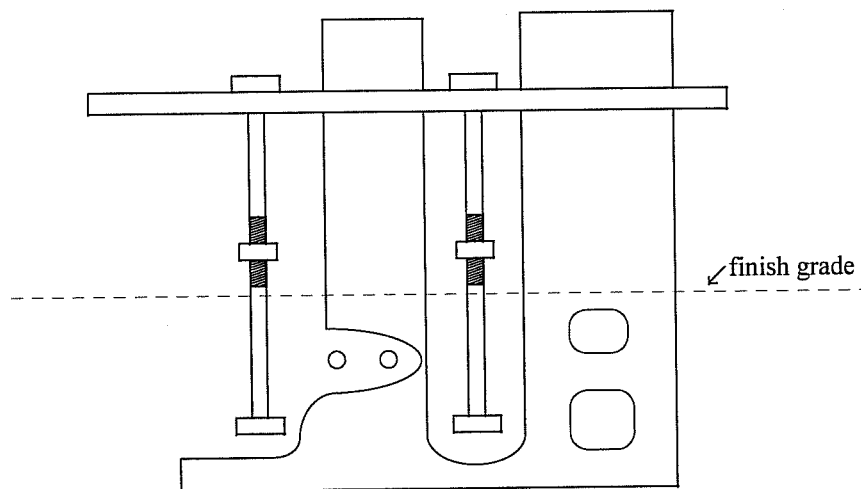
Sheet Metal Shape for Double-Anchor Shear Tests
